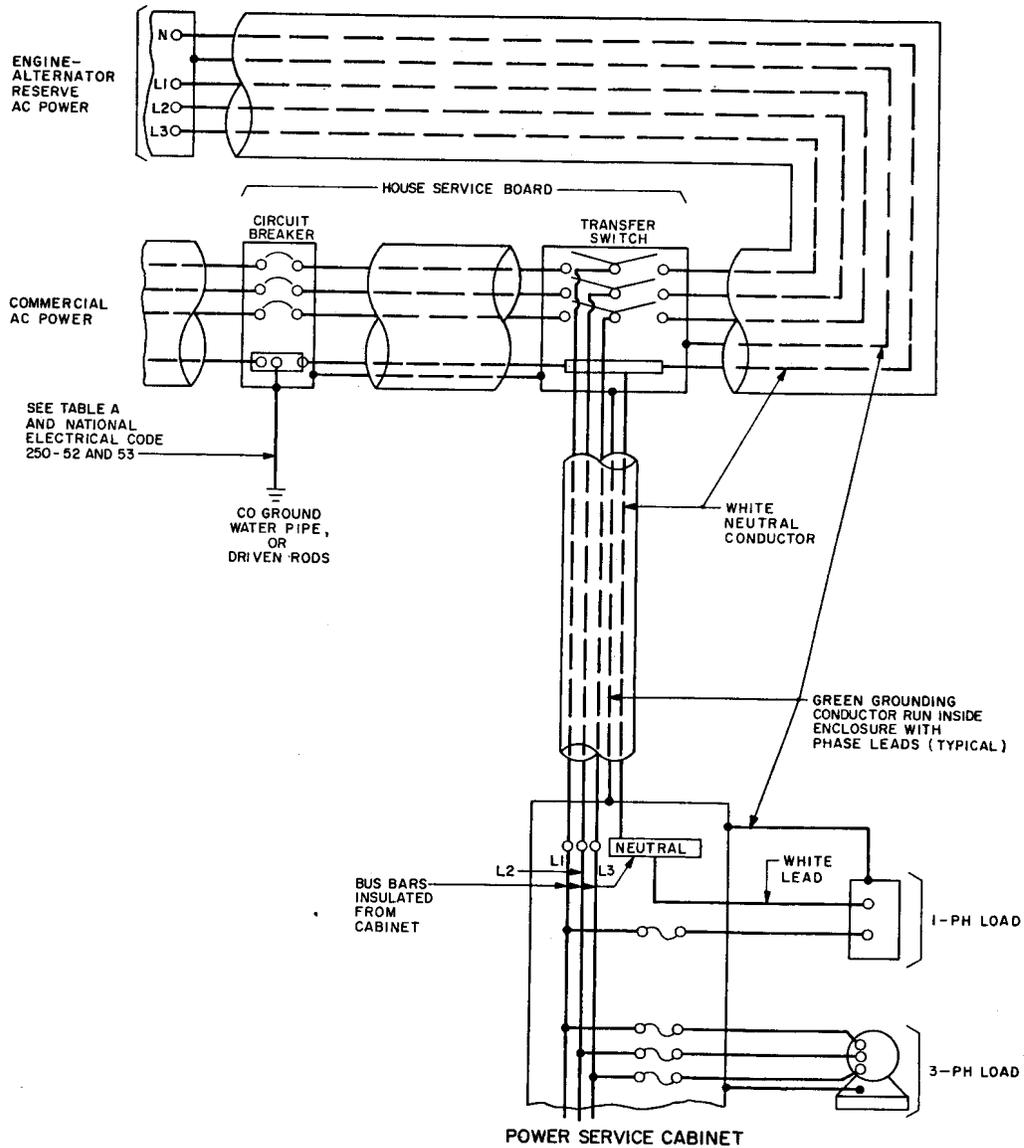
Typical Equipment Grounding Arrangement Utilizing the Green Wire
